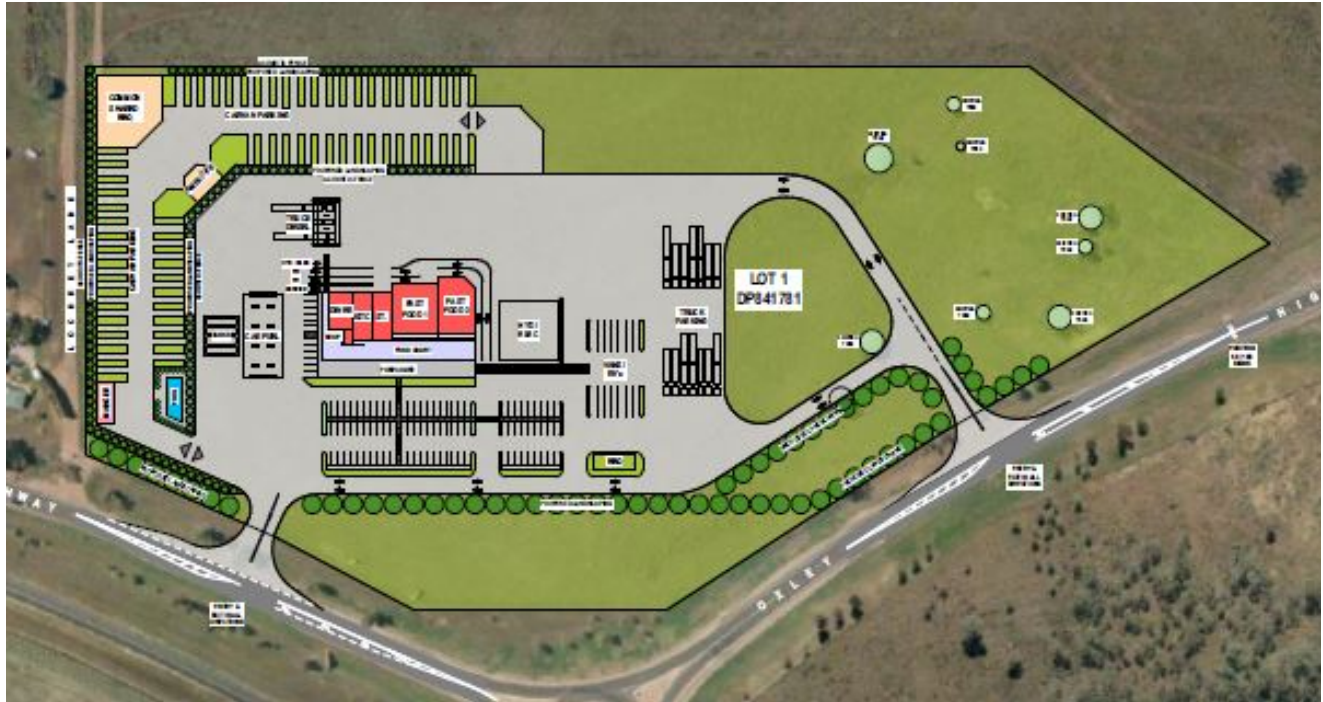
Conceptual Site Layout (Source: Hill Lockart Architects)
